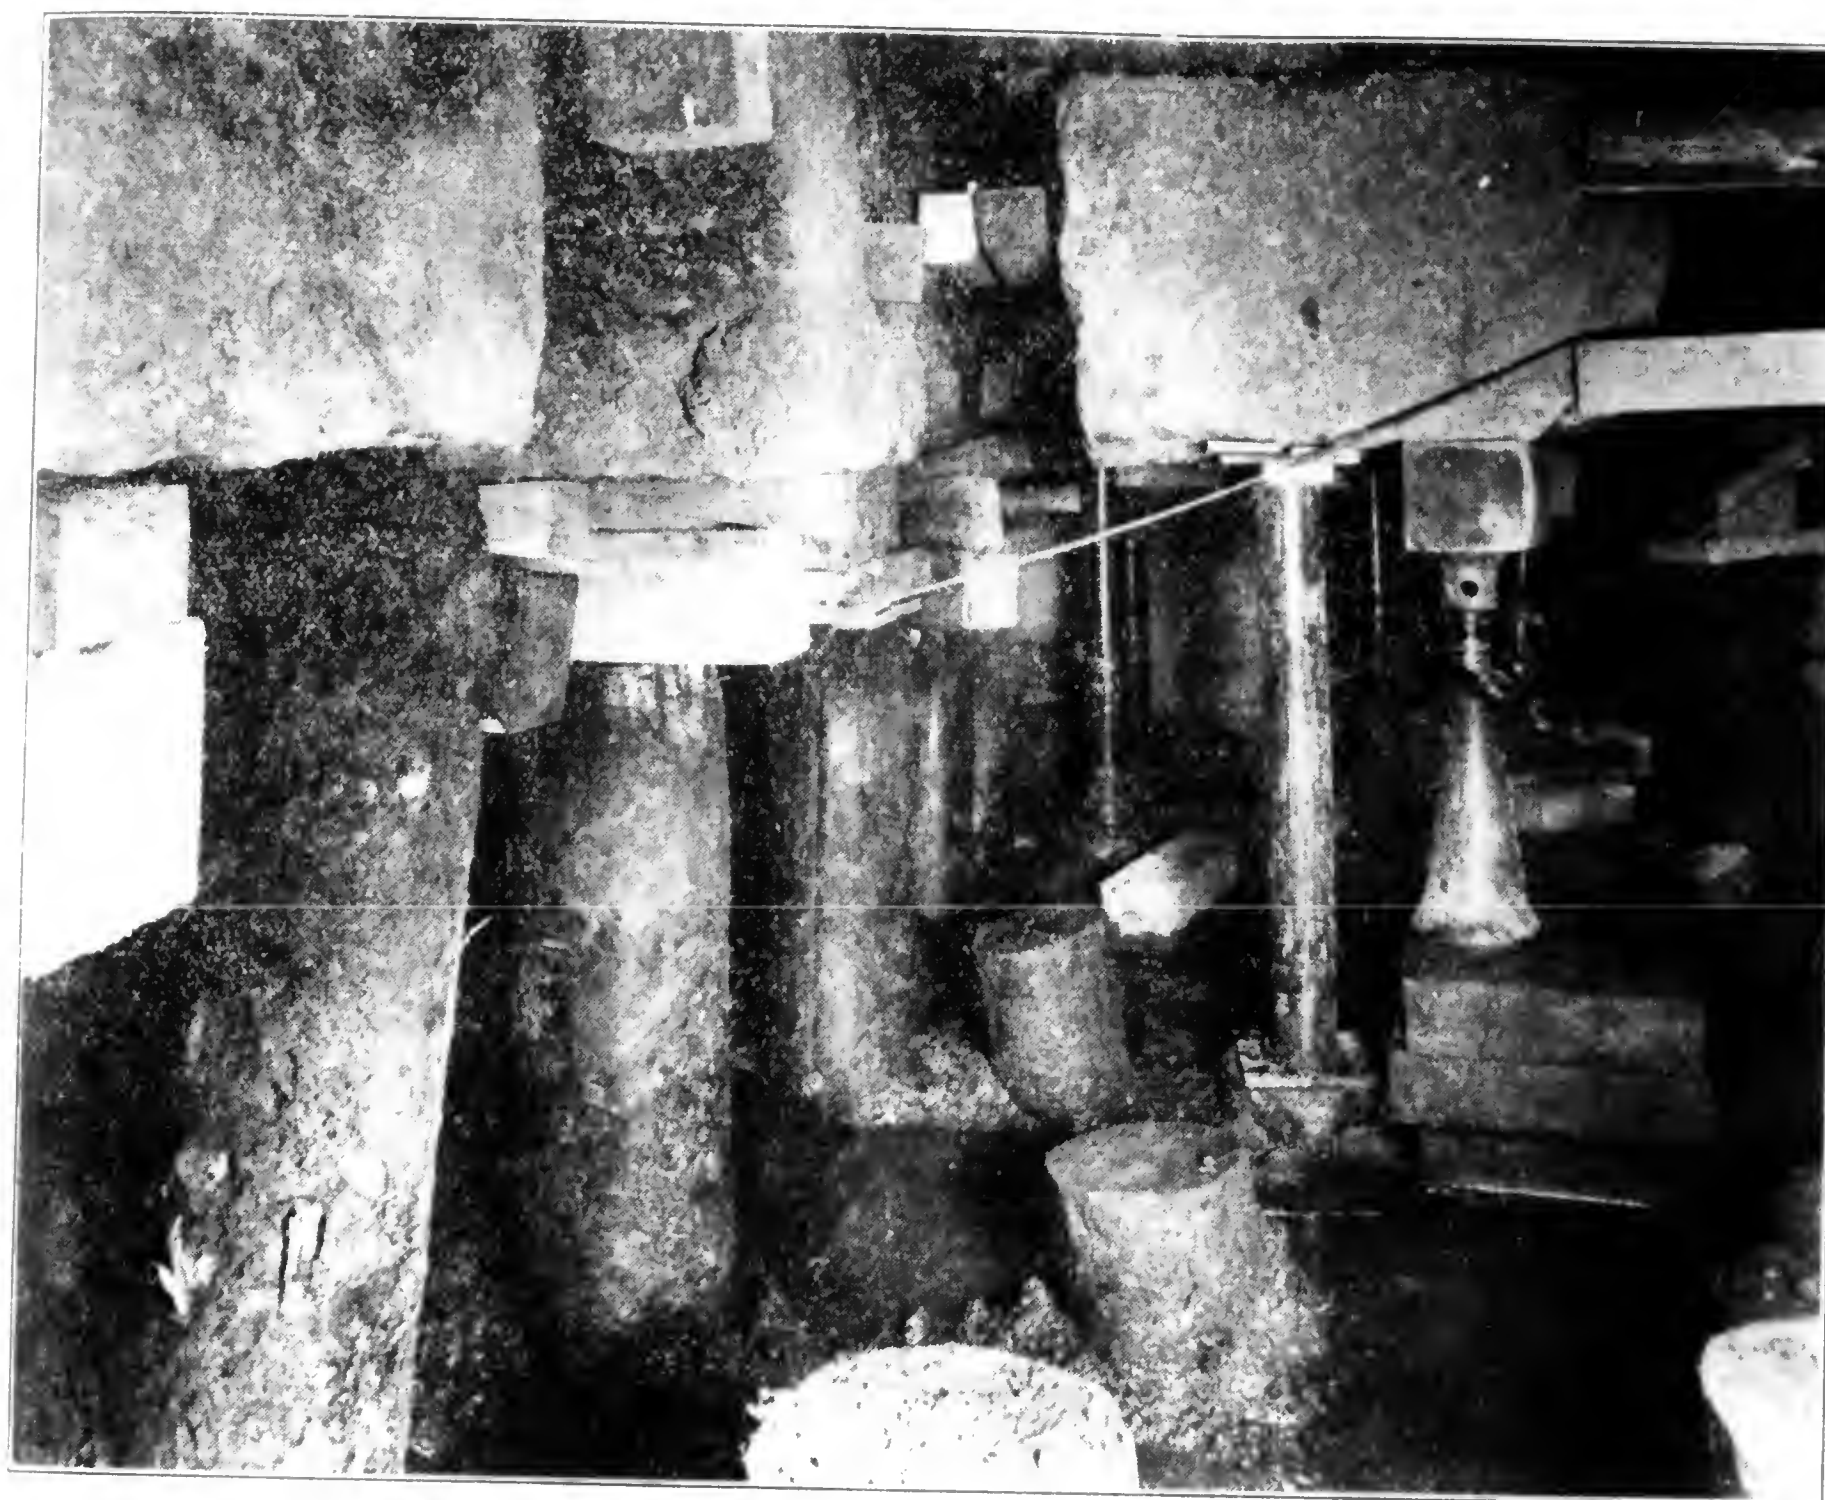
PHOTO OF VIEW UNDER FOUNDATION OF PUBLIC LIBRARY, COPLEY SQUARE, SHOWING HOW PILES UPON WHICH FOUNDATION RESTED HAD ROTTED AWAY, LEAVING THAT SECTION OF BUILDING IN DANGER OF COLLAPSE. MENACING LIVES OF ALL USING LIBRARY.
